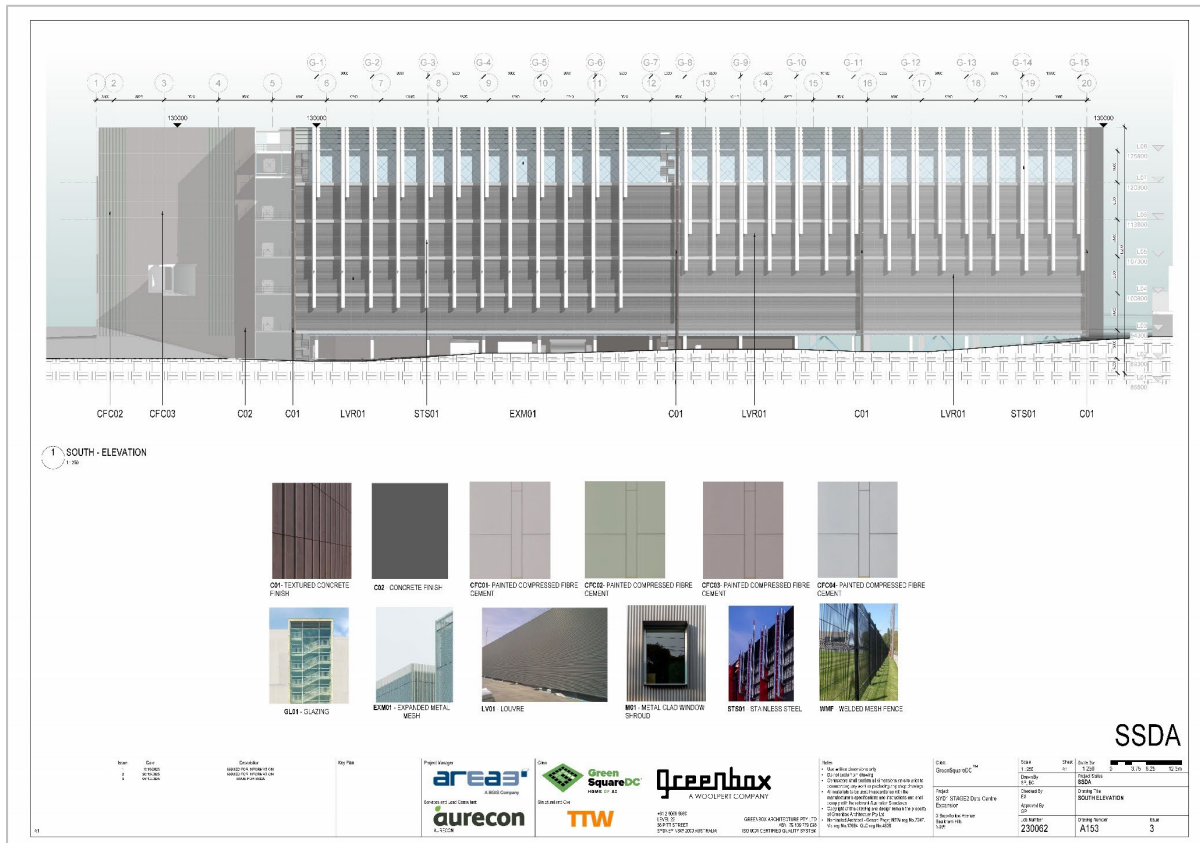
Southern Elevation (Source: Greenbox. 2025).
